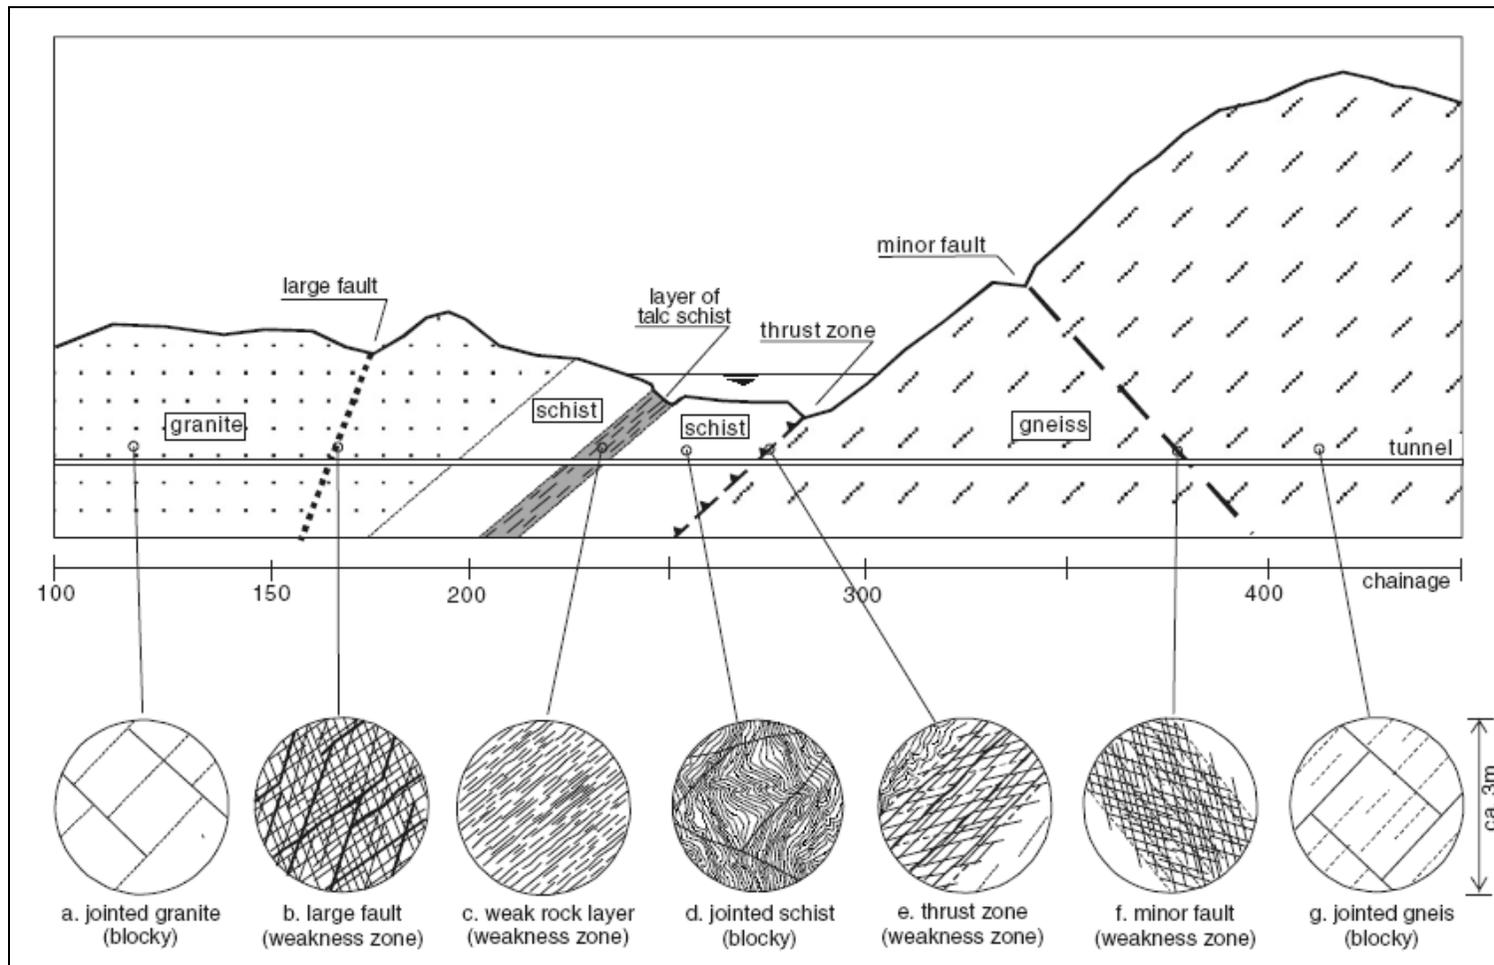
Examples of rock mass compositions along a tunnel route (after Stille and Palmstrom, 2008)
